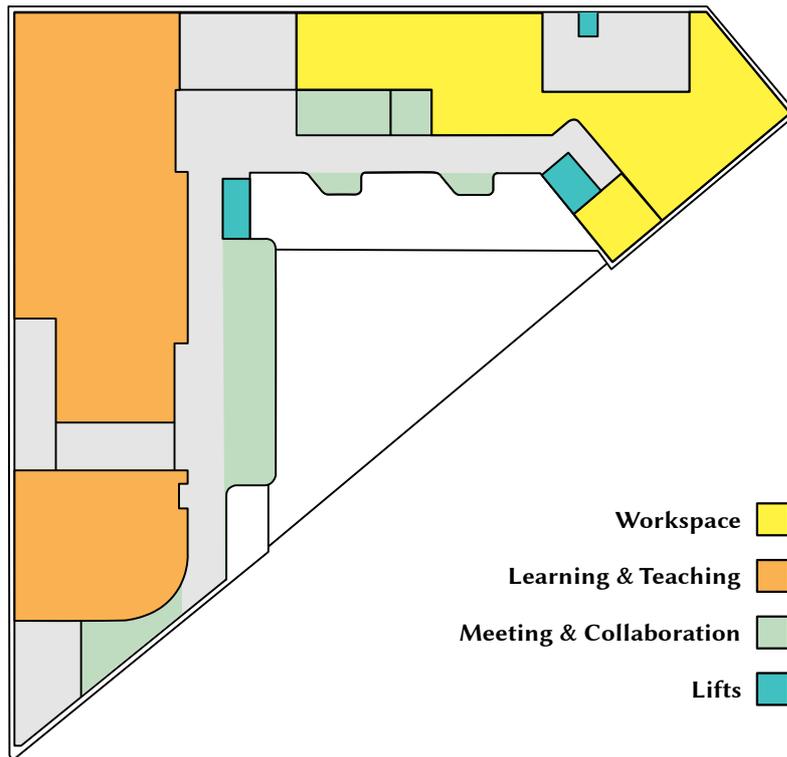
Urban Sciences Building 3rd Floor: a floor plan adapted from the building's architectural drawings, showing the zoned areas on the north (yellow) and west (orange) sides of the building
